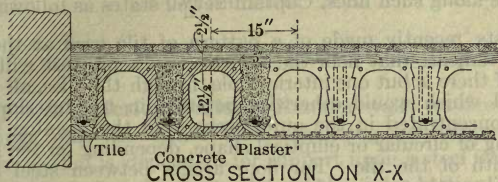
Combination Floor as used in War College Building, Washington, D. C.
